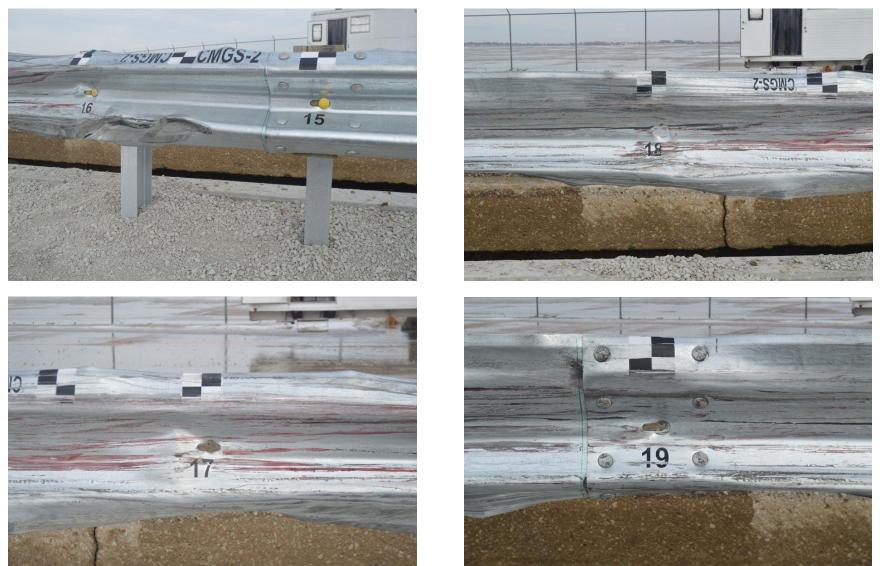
Guardrail Damage, Post Nos. 15 through 19, Test No. CMGS-2
